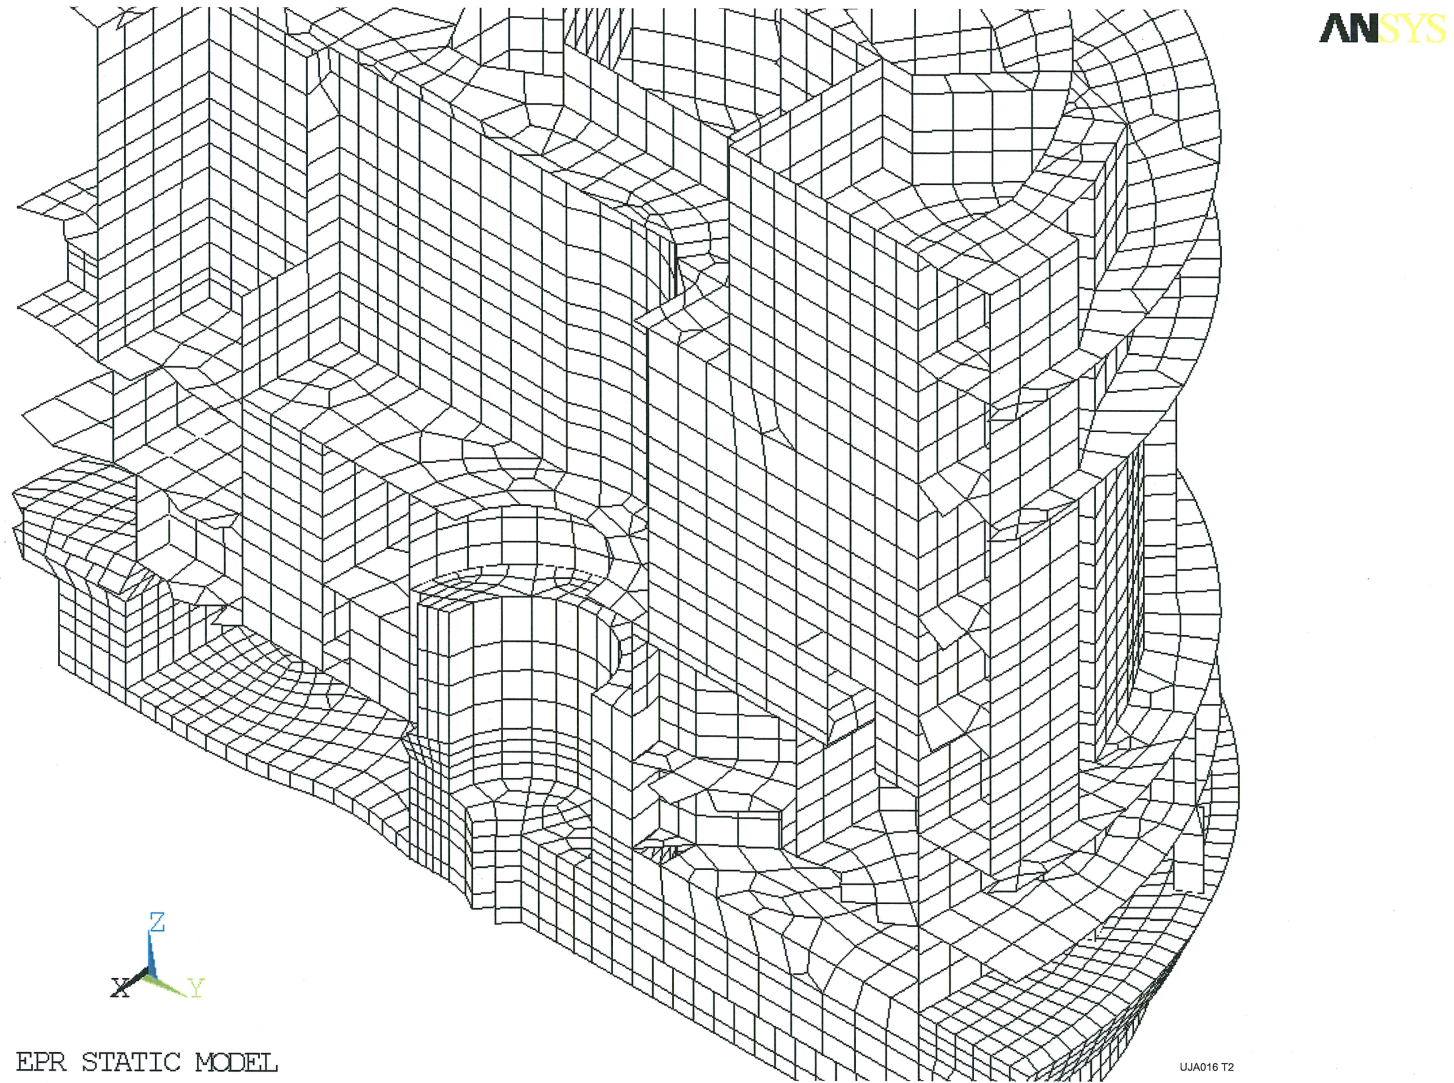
Reactor Building Internal Structures ANSYS Model – Section through Center of Building Looking North
